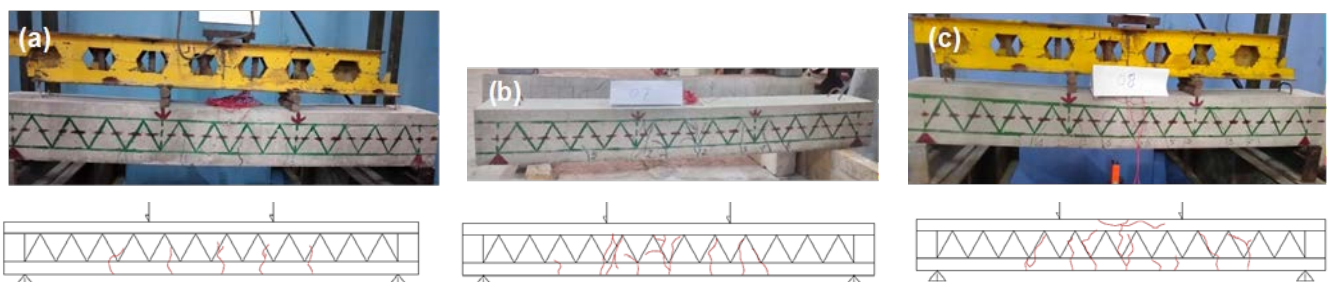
Crack pattern of the Warren-truss reinforcement system for (a) BW-1, (b) BW-2, and (c) BW-3
